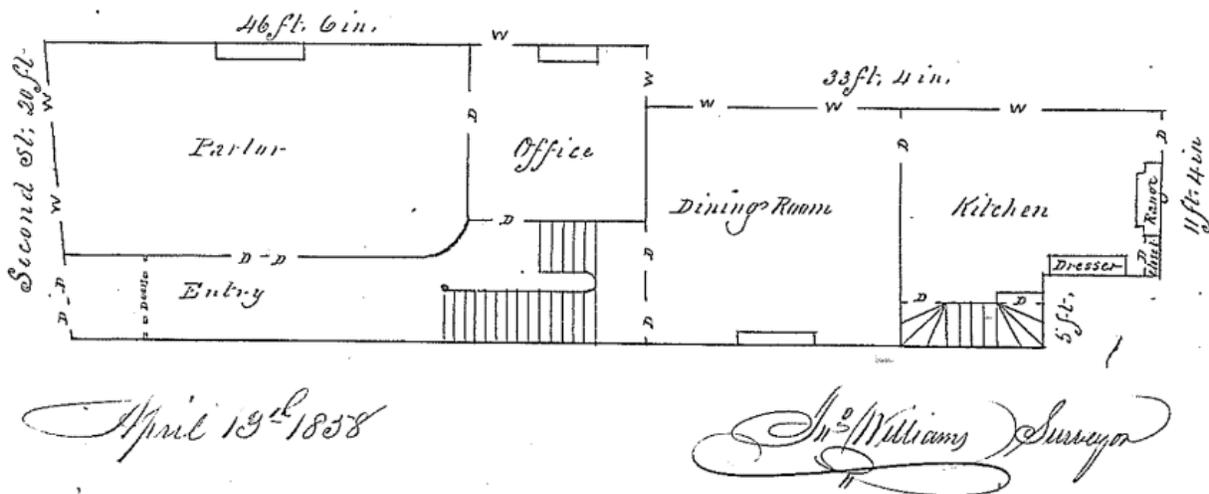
Floor plan sketch from 1858 Insurance Company of North America fire insurance survey. Source: PHC archives.
